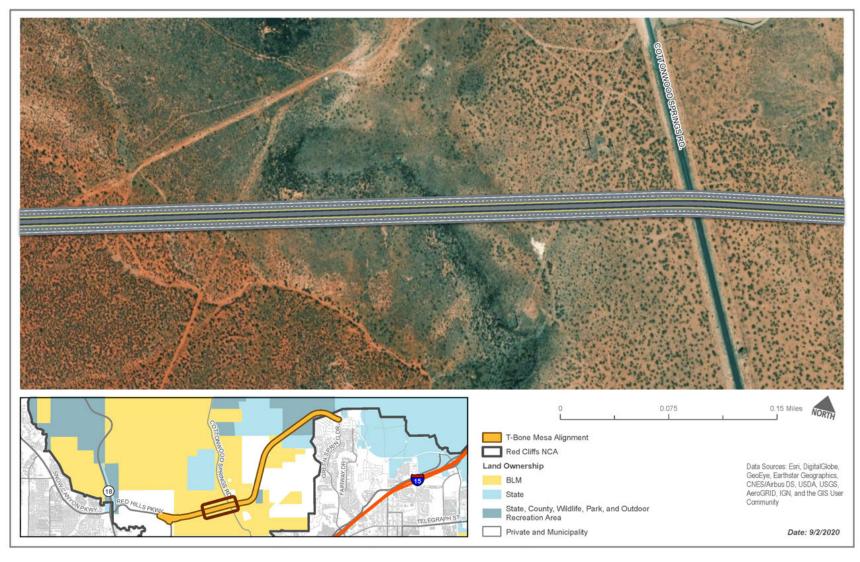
T-Bone Mesa Alignment Plan View (3 of 8)
